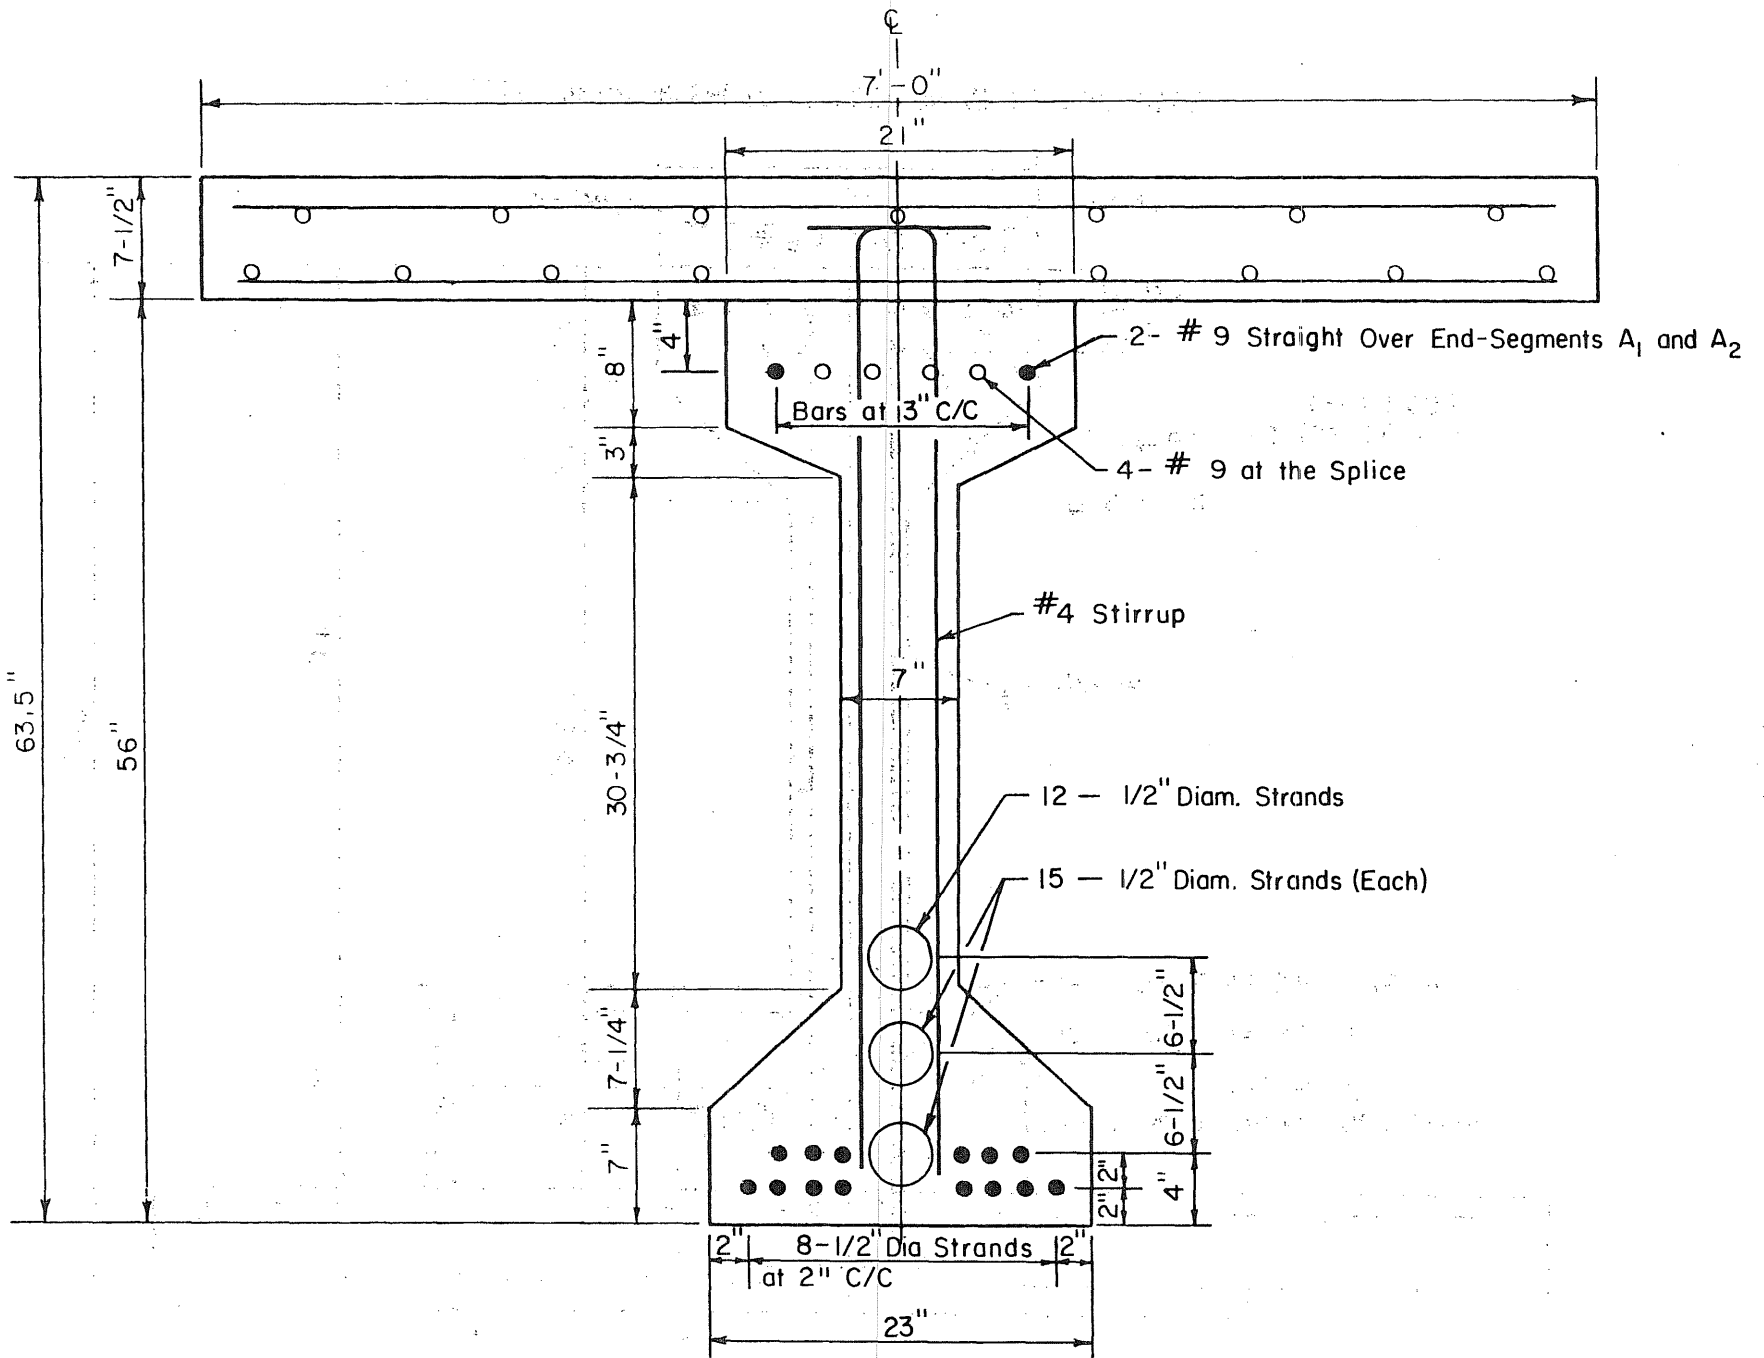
ARRANGEMENT OF REINFORCEMENT IN END SEGMENT AT SECTION 50 FT FROM ABUTMENT
